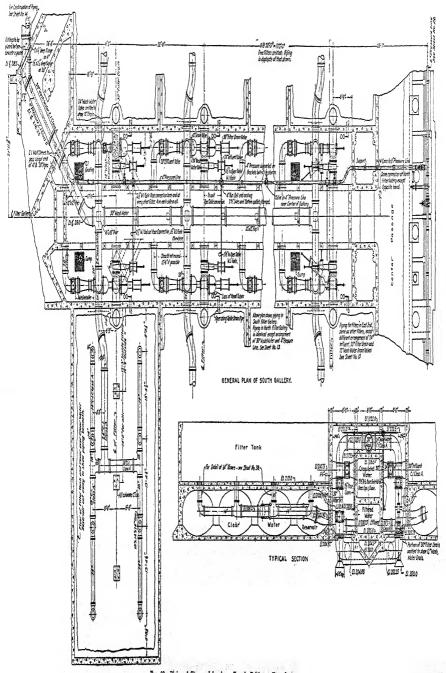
Piping of filters and in pipe gallery in Baltimore filter plant.
